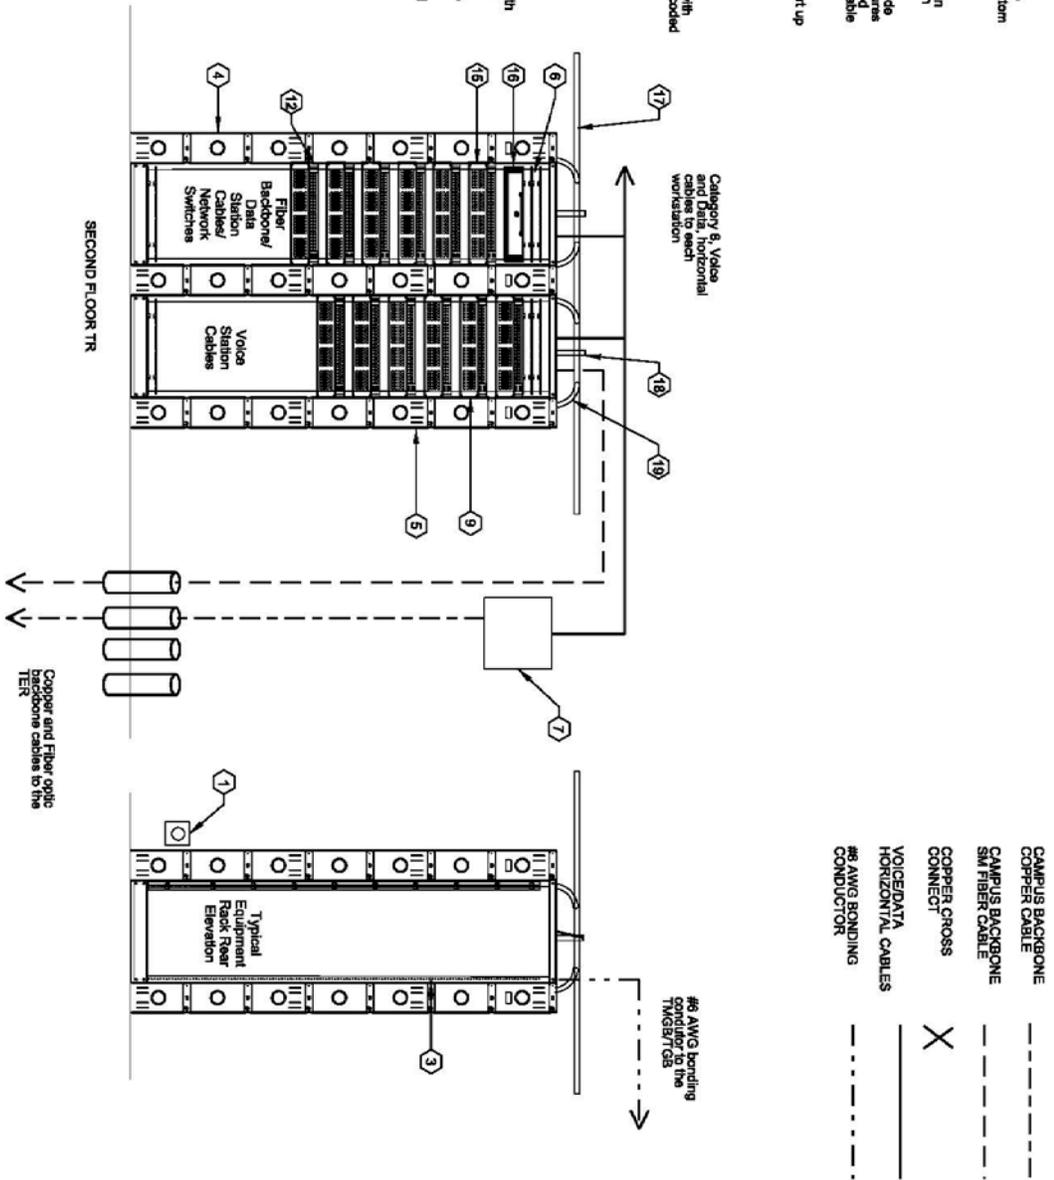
Typical Entrance Facility (EF) and UHS Elevations
